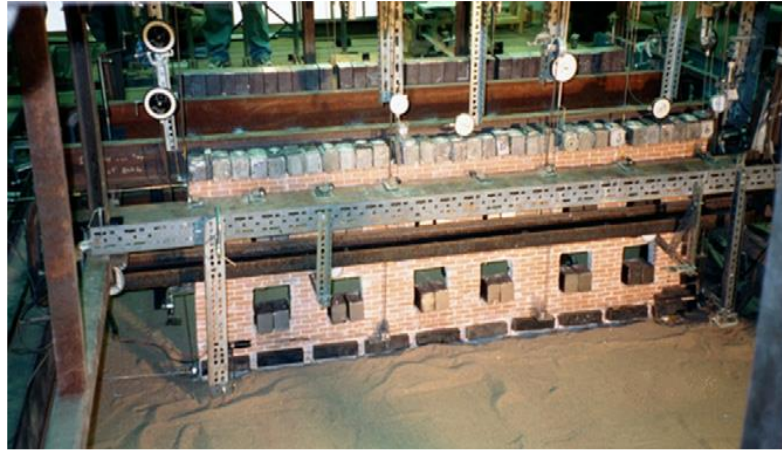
Test wall used in the study of Laefer et al. (2011)
